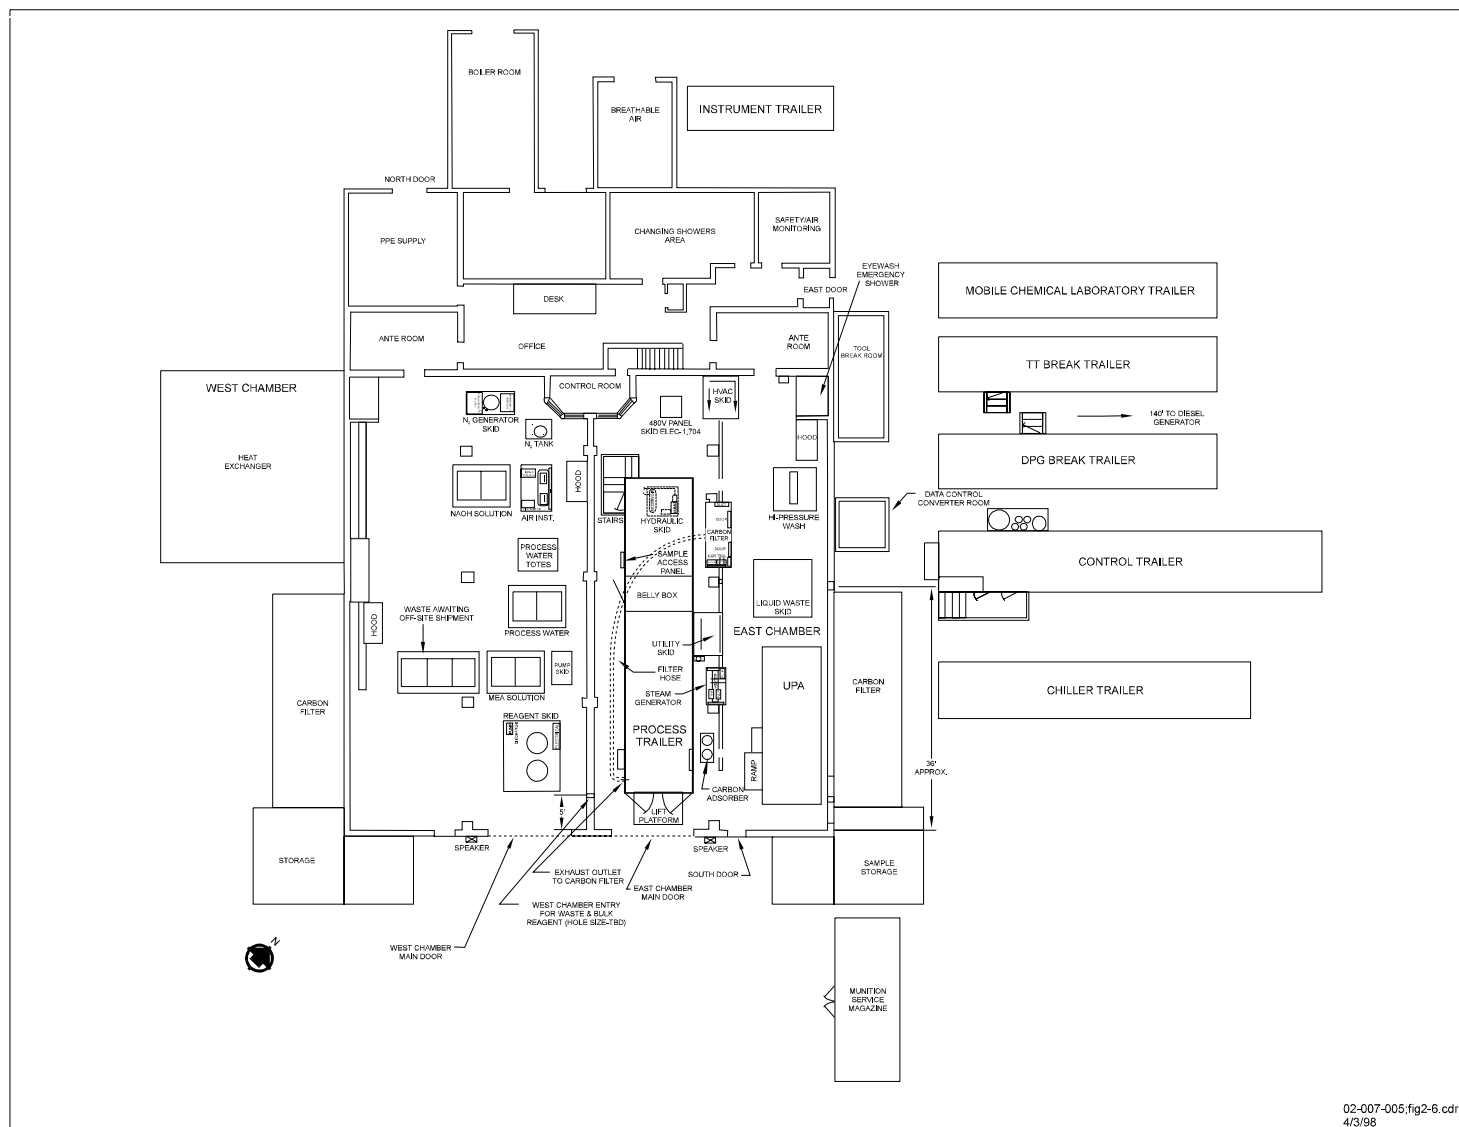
Layout of the MMD-1 in Building 3445, East Chamber
